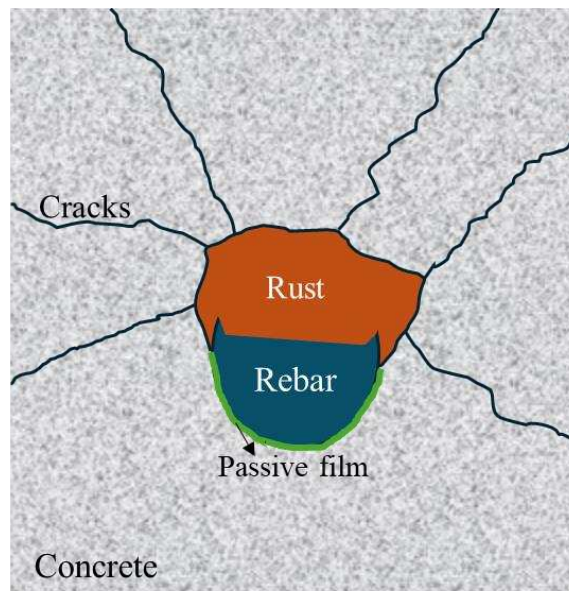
Schematic drawing of rebars corrosion on a cross section of reinforced concrete
